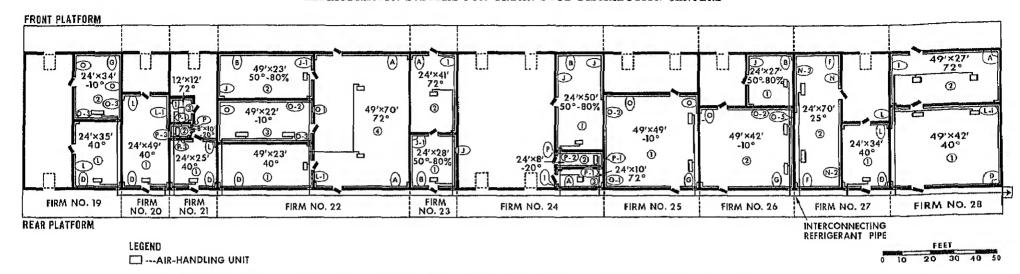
Situation II, Building No. 3 (poultry and eggs), floor plan and air-handling equipment layout.
